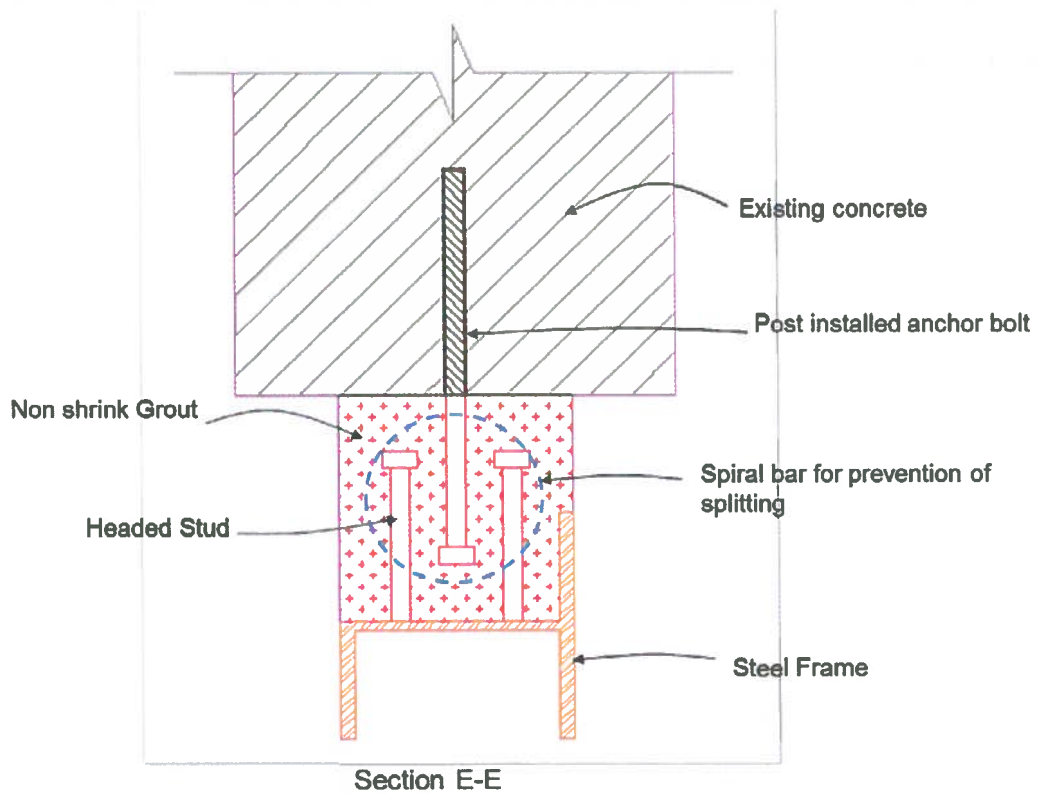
Connection Details between Existing RC Frame and Steel Frame Bracing
